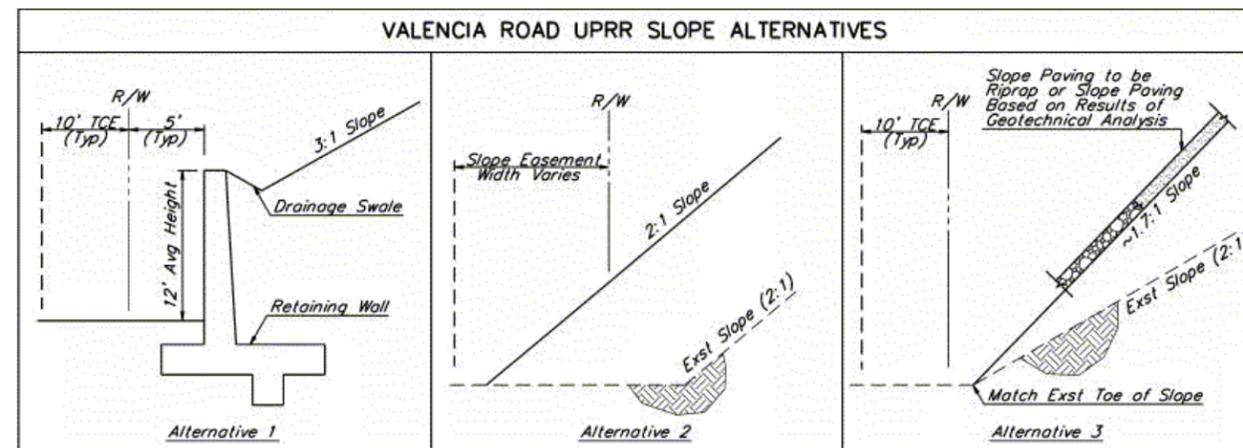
Valencia Road UPRR Bridge Approach Slopes
